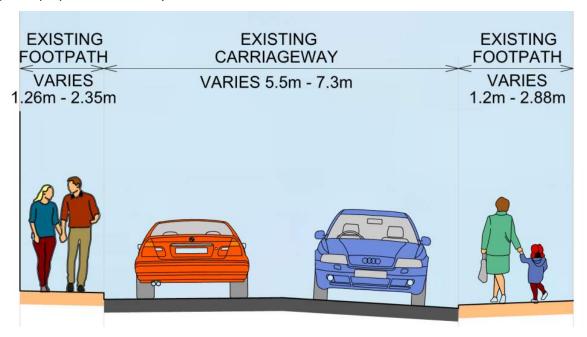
Typical Section 2 Do Nothing Scenario Cross Section South Circular Rd
